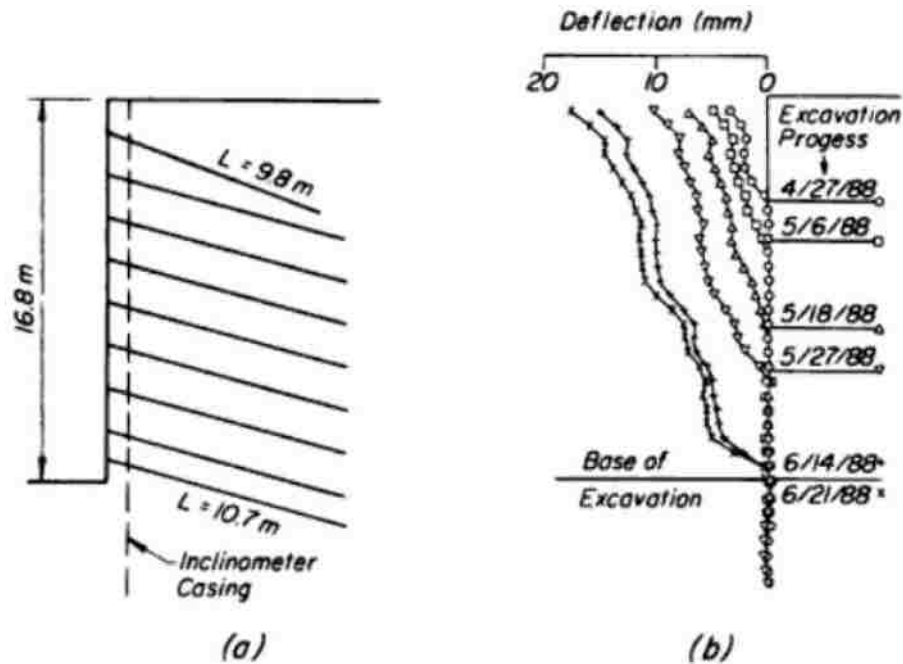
(a) Geometry of soil-nailed wall in heavily overconsolidated glacial deposits in Seattle (b) Deflected position of face of wall at various excavation stages
